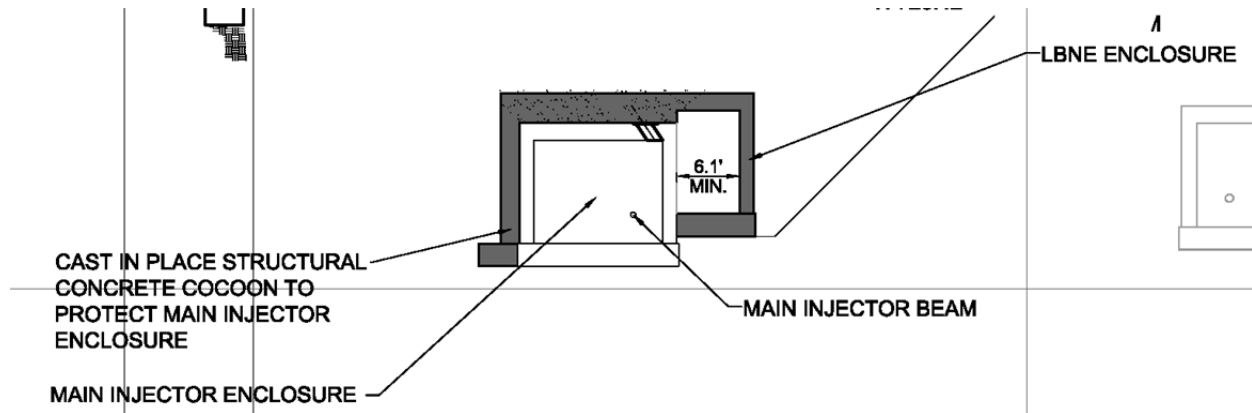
Beamline Extraction Enclosure at the connection to the MI enclosure showing the structural concrete cocoon around the MI enclosure.
